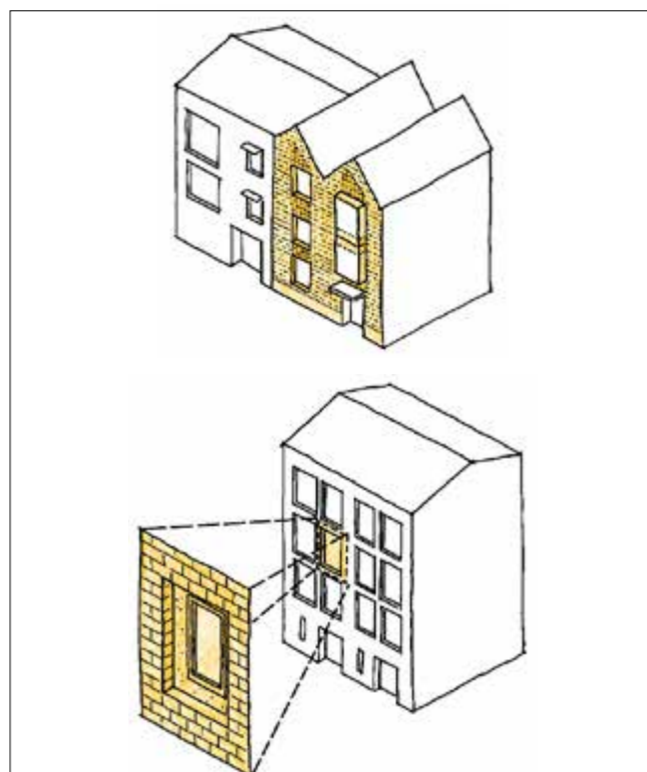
Including interesting details will ensure that buildings are attractive from a distance and close-up
